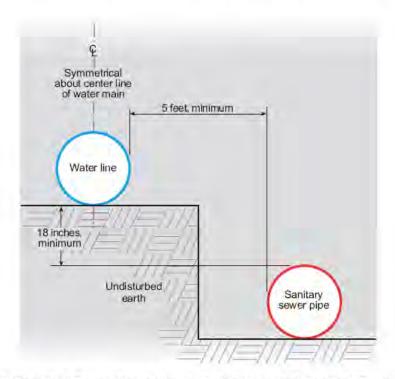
Required Separation Between Water Lines and Sanitary Sewers, Unusual Conditions Parallel Construction
